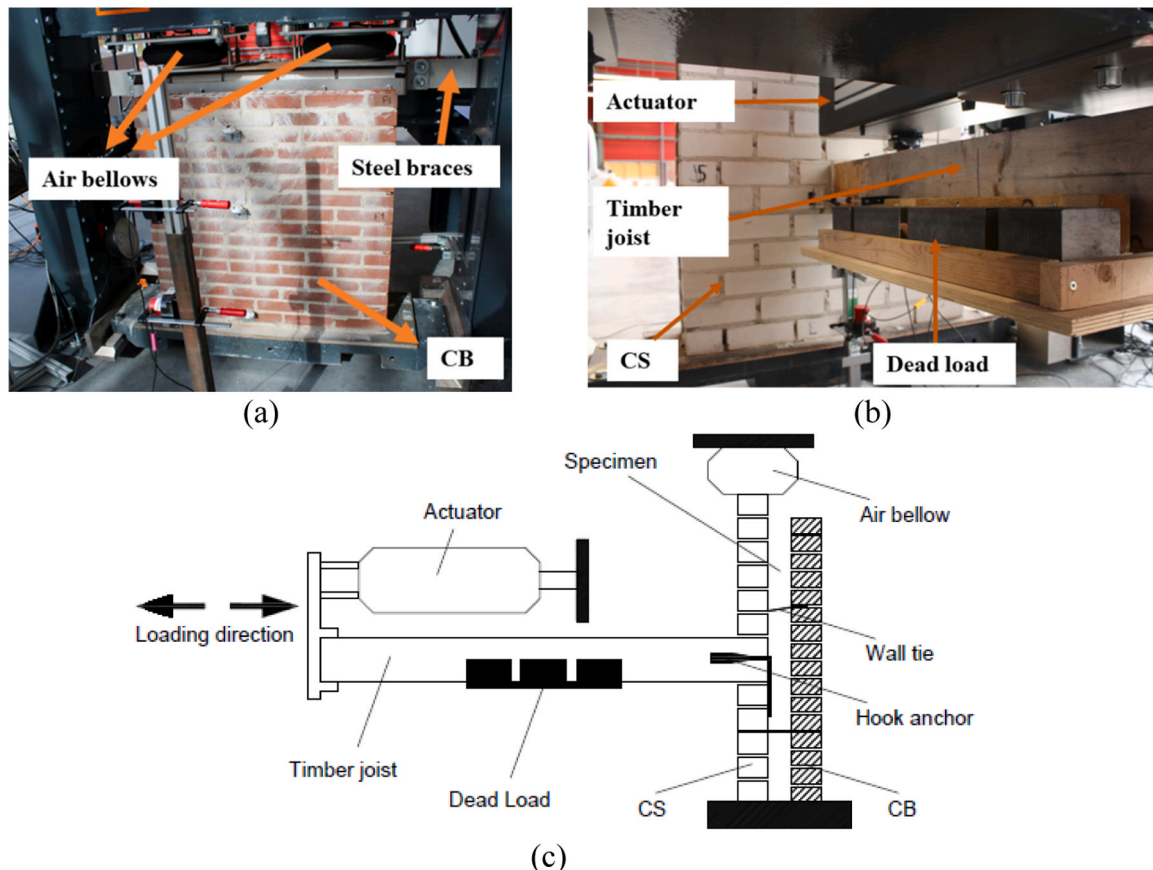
Test setup: Air bellows, steel plate and braces details (a); detail of actuator and dead load (b) and schematic view of the test setup (c).
